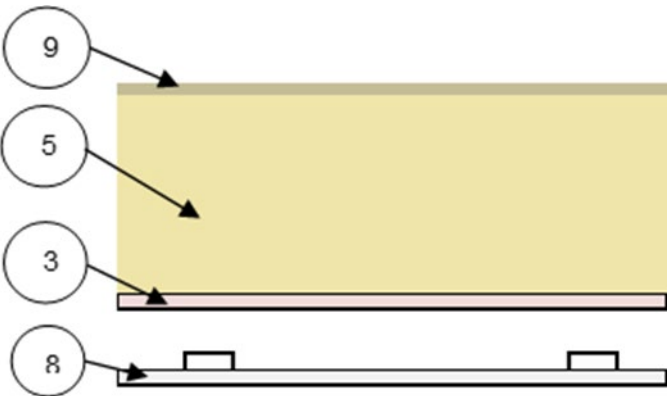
Massive timber floor ceiling system with fire grade lining directly fixed to the massive timber and including optional a suspended decorative ceiling – Section view
